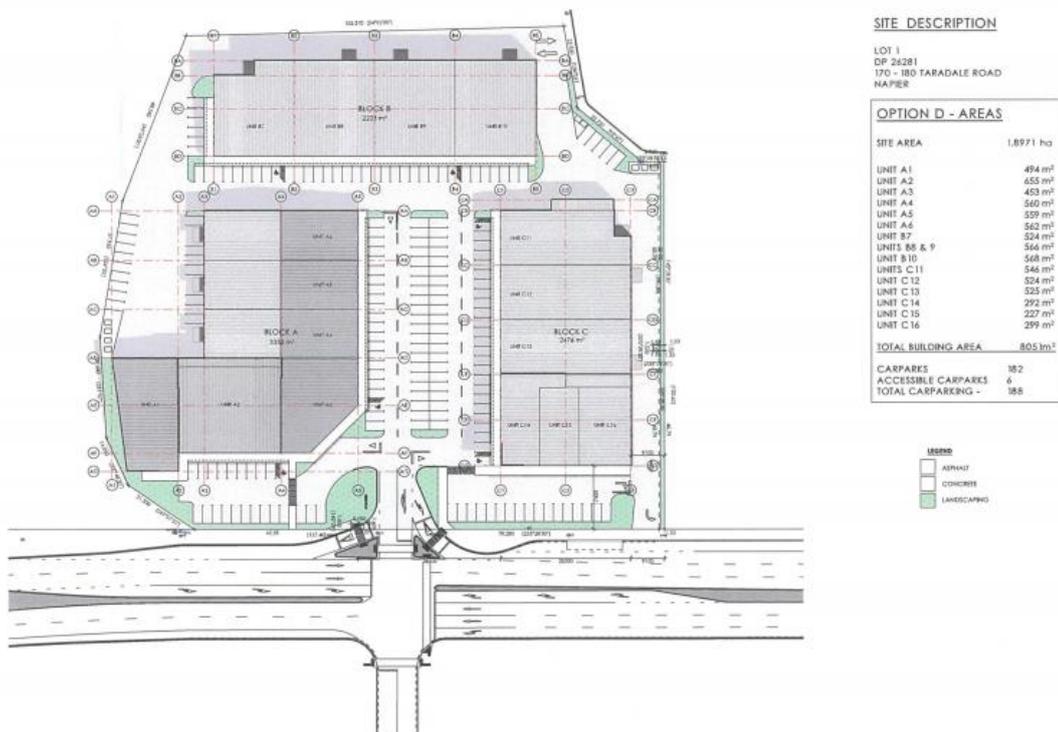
170 Taradale Road proposed commercial/retail multi-unit development proposed plan
